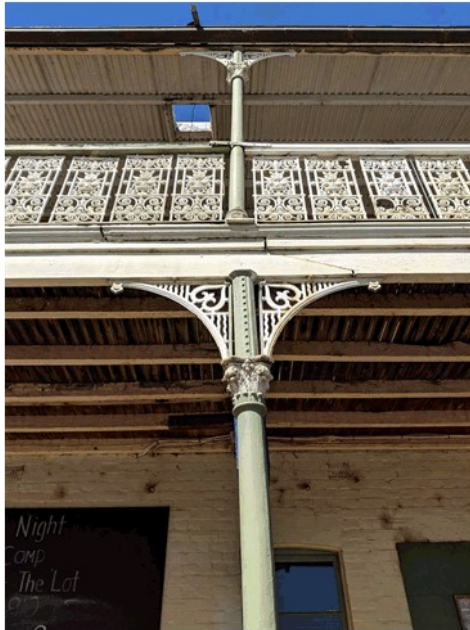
The second column in from the end and damaged timbers at the floor level.
